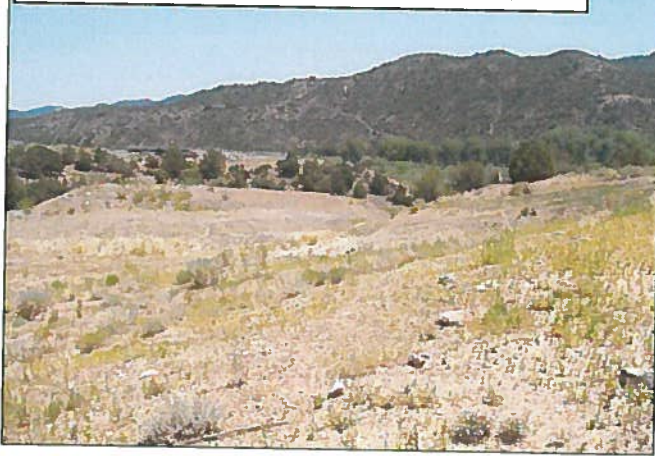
Slopes between lower eastern section and center of permit boundary looking south.
